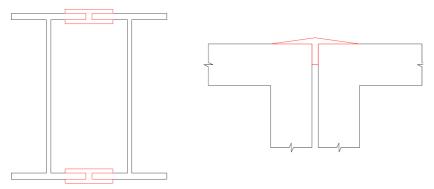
Left: H-shaped connection profile, right: T-shaped profile between two roof panels
